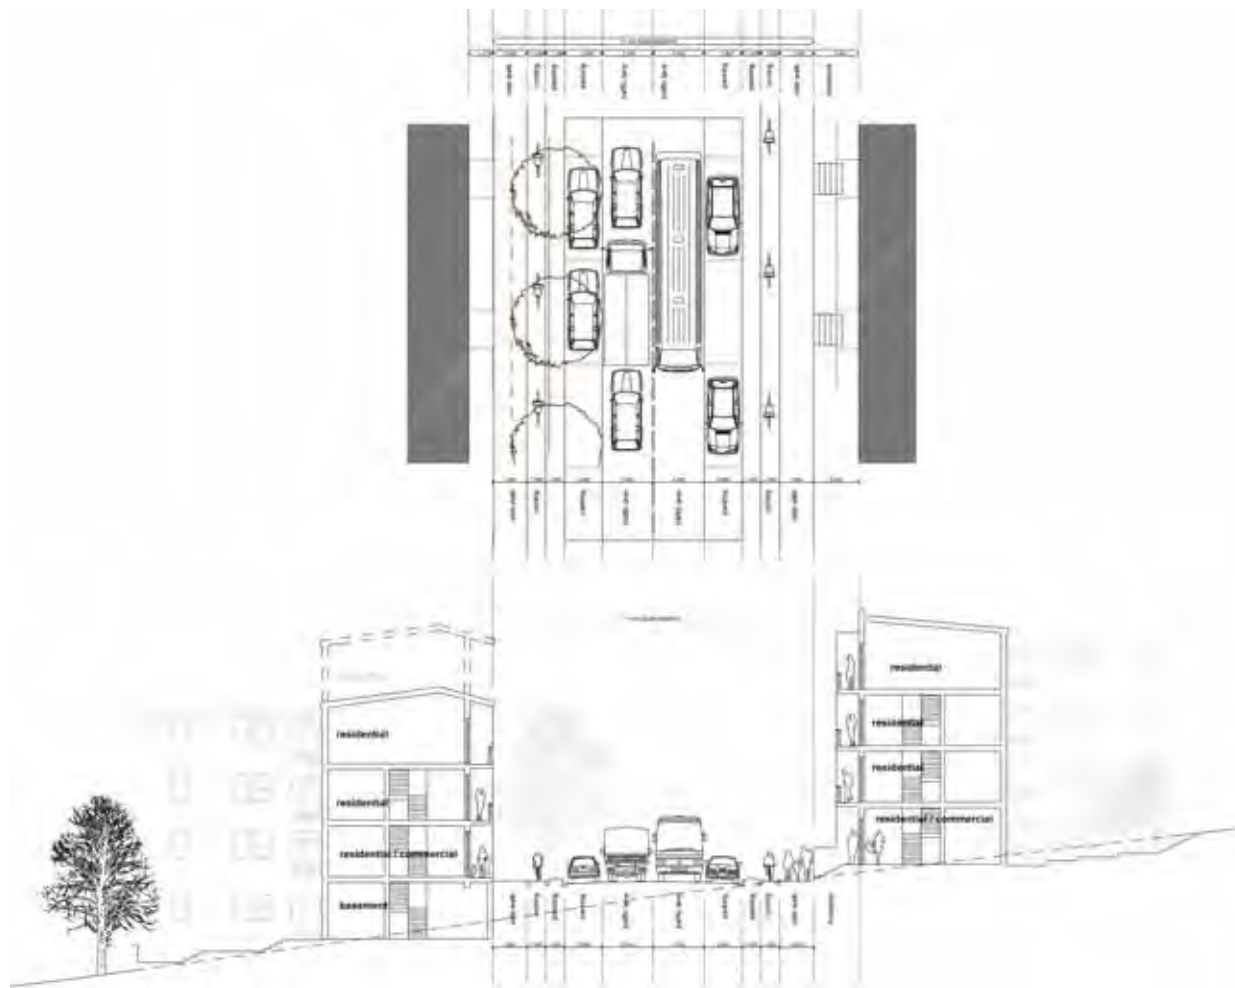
TYPICAL SECONDARY STREET PLANS AND SECTIONS
